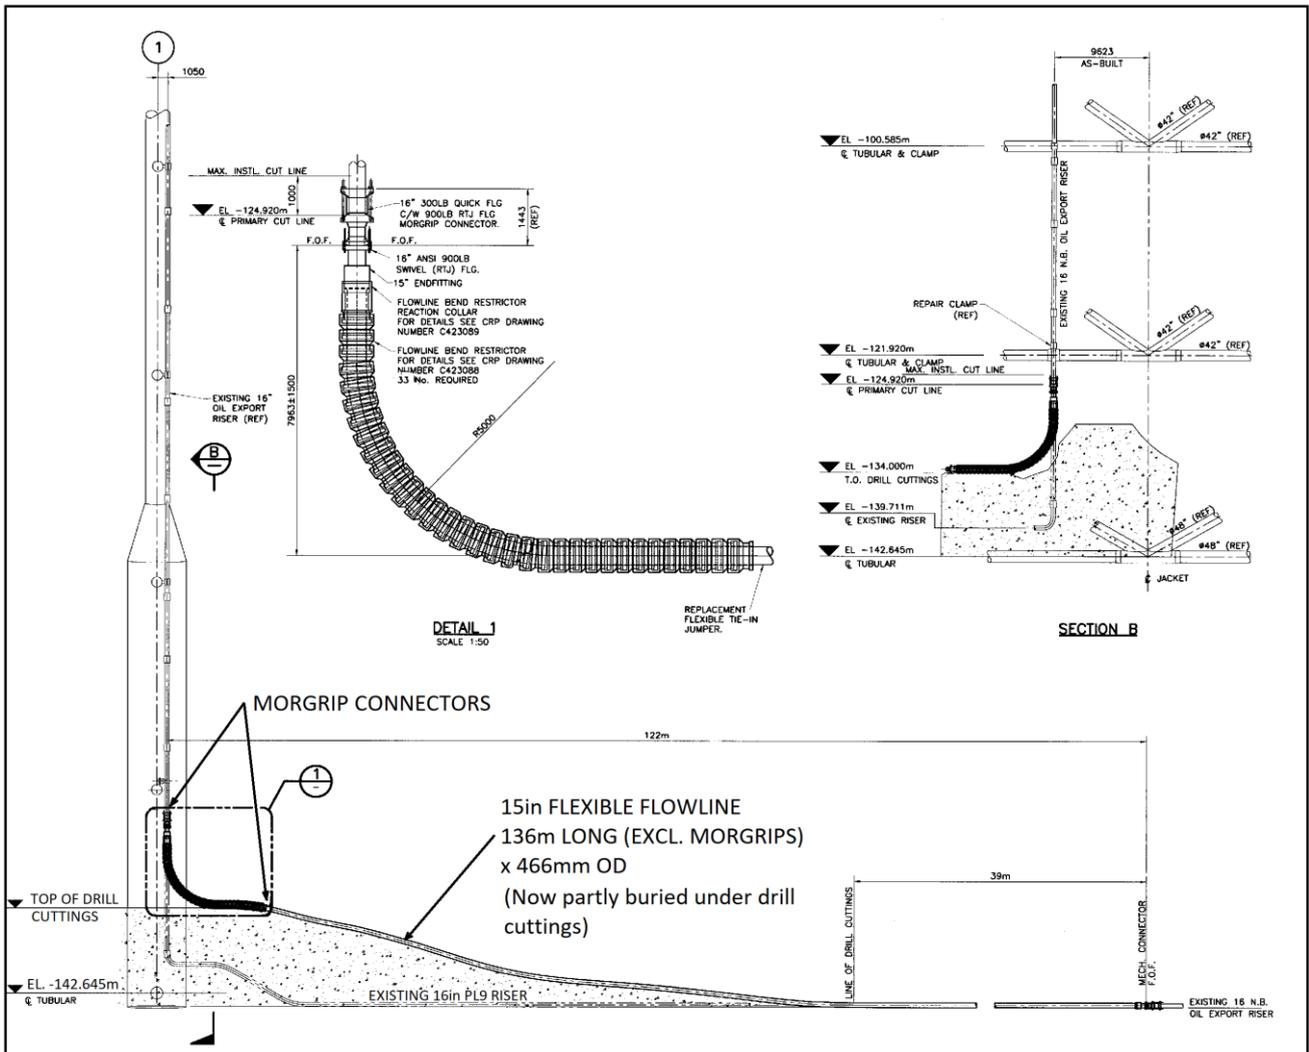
Elevation & section of PL9A connected to PL9 at Heather
